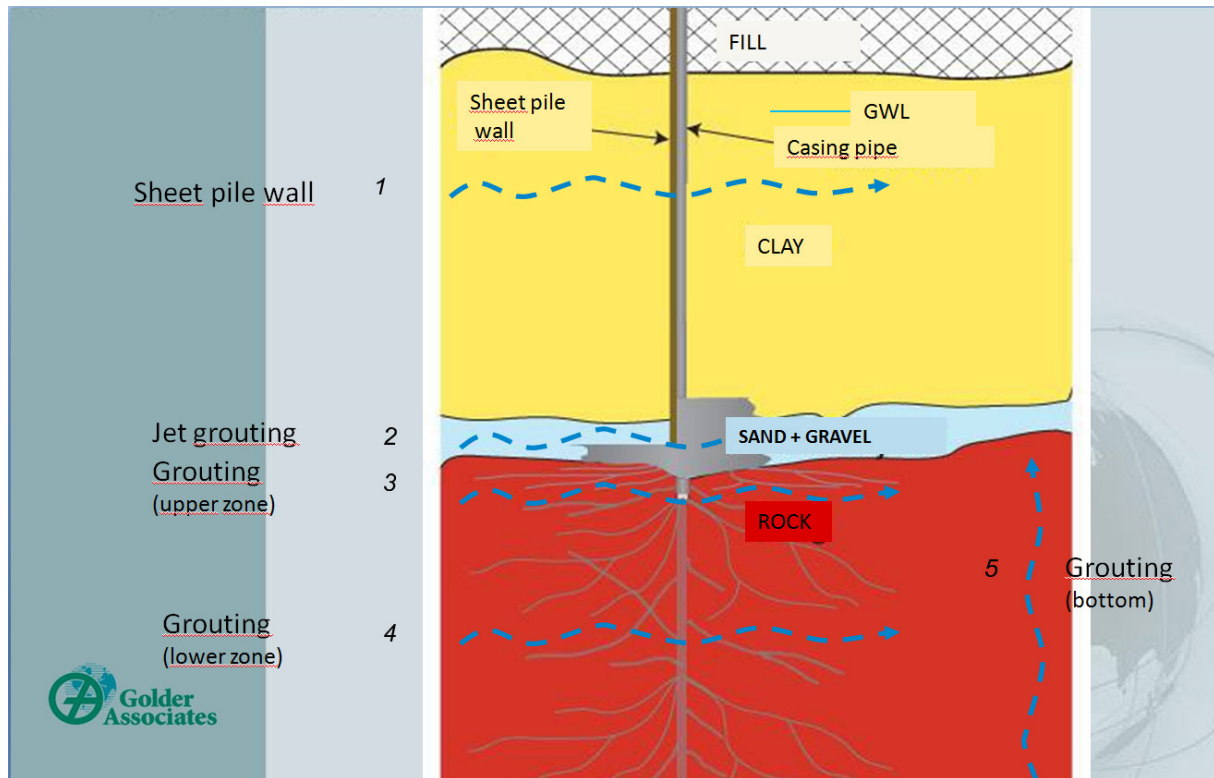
Construction of a diaphragm wall with sheet piles that both seals against water inflow and prevents wall collapse into the pit and grouting that takes place on several levels, and with different methods. In many cases, the wall is secured with reinforced and anchored concrete. 1) The constructed membrane in the fill and clay consists of a sheet pile wall that both seals against water inflow and prevents wall collapse into the pit. In sandy soils over rock and in the rock mass, sealing is achieved by grouting. 2) Jet-grouting is carried out at the soil bedrock boundary. 3-4) Pre-grouting in the rock may need to be done at various levels, and even final bottom grouting may be required (5). The rock surface (3) is often poorly sealed, and can together with any sandy soils form a leakage pathway that may or may not be further connected to any deeper rock aquifer if it exists. (4) Modified after original by Mikael Creütz, Golder.
